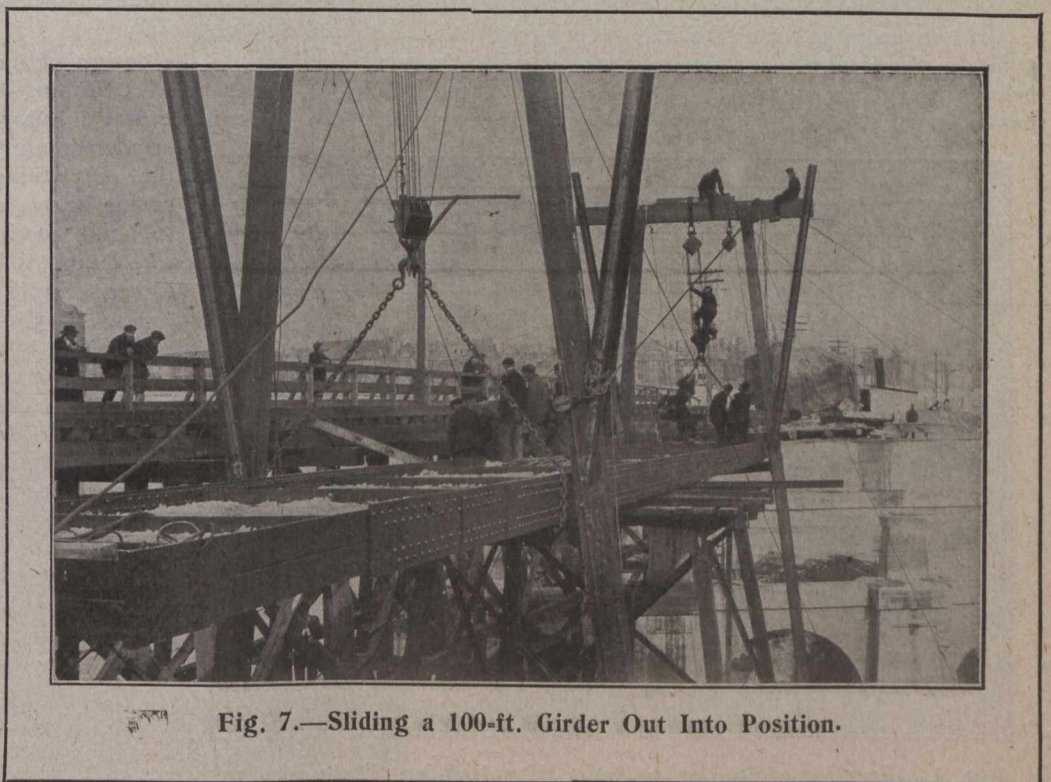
Sliding a 100-ft. Girder Out Into Position.
